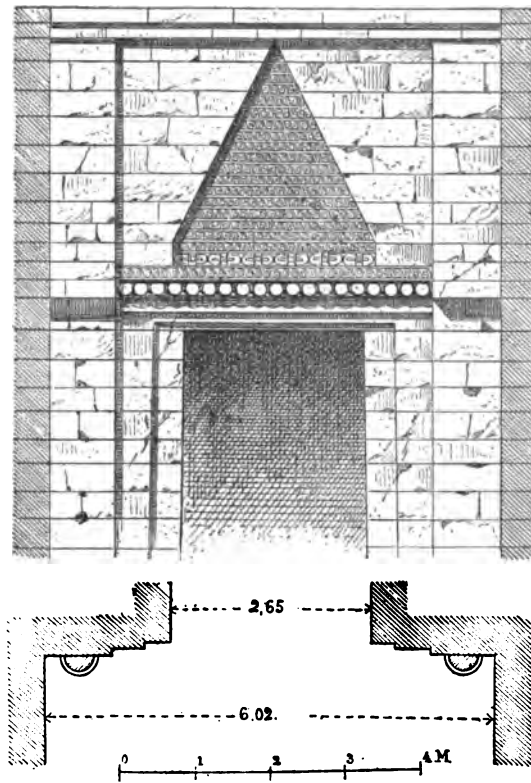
Tomb II. Partial restoration and plan of façade.
